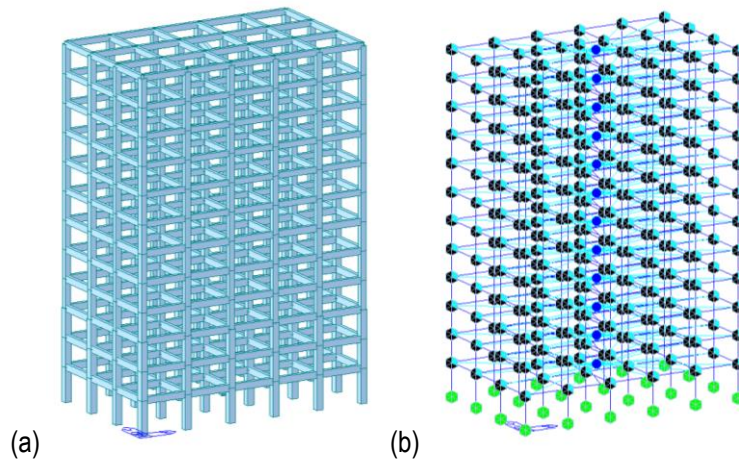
Numerical model of the benchmark building: (a) view of the structural model in MIDAS Gen and (b) boundary conditions, nodal masses and diaphragm constraint at each floor.
